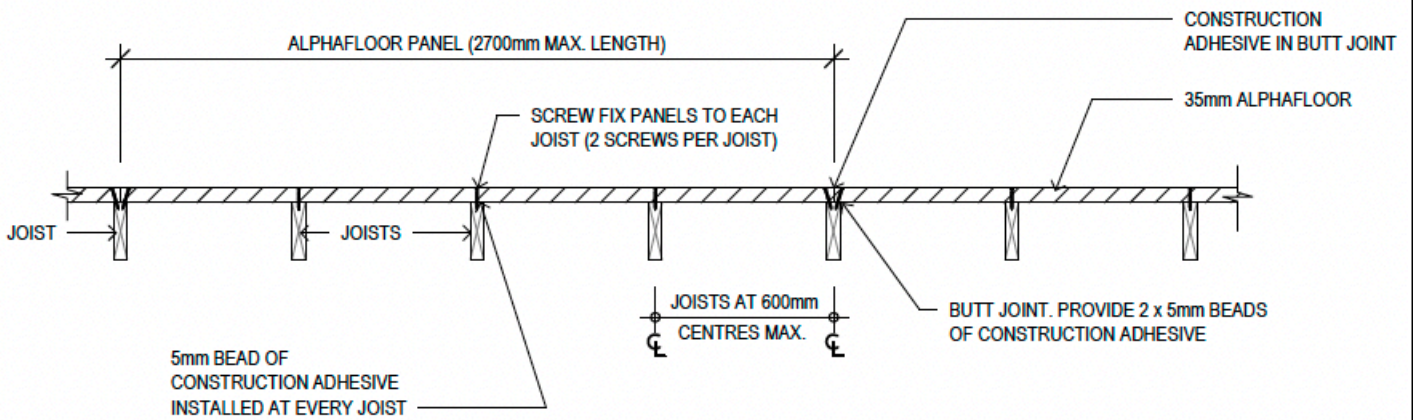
FLOOR SECTION - PARALLEL TO JOISTS
